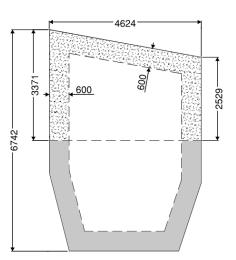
Stage 1 Concrete Placement (Dimension Shown are in mm)
